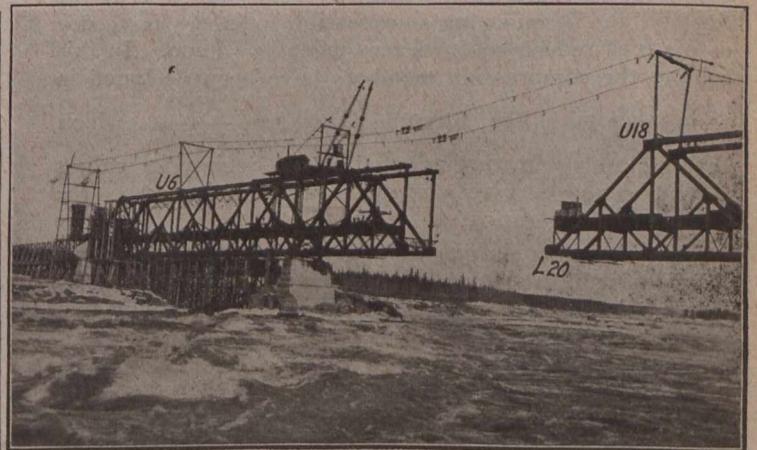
Northern Anchor-span Erected, Also 100 Feet of Adjacent Cantilever. Note Additional Rocker-bent at U6 for Supporting Cables
